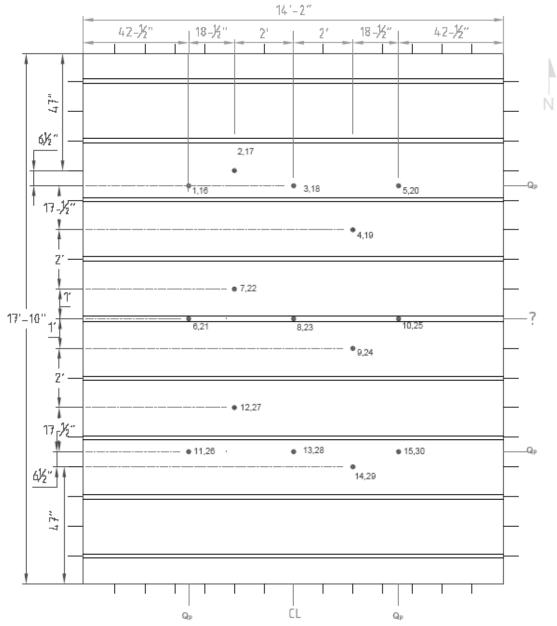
Thermocouple Locations on Subfloor and Carpet Padding.
